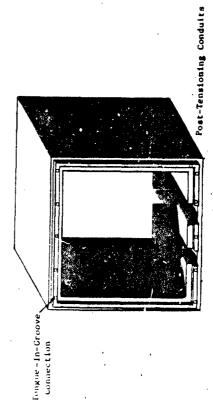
RECTANGULAR PRECAST CONCRETE SHELTER.
